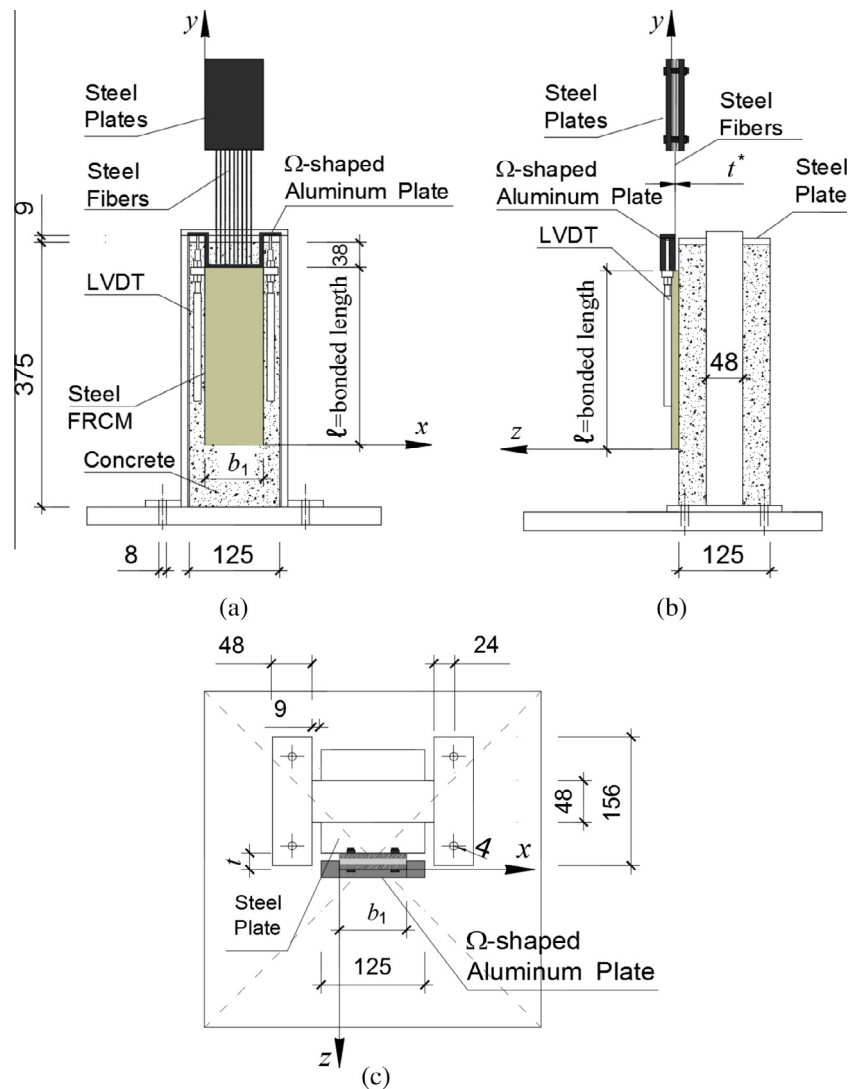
Single-lap direct-shear test set-up (a) front view, (b) side view, and (c) top view (dimensions in mm).
